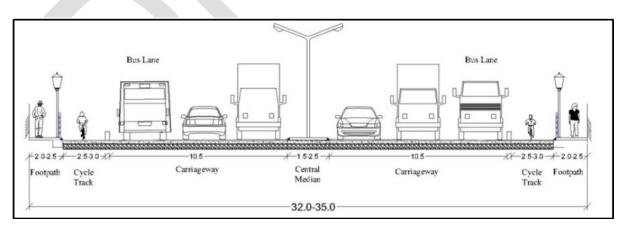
Proposed Road Cross Section with Cycle Tracks (Six Lanes)
